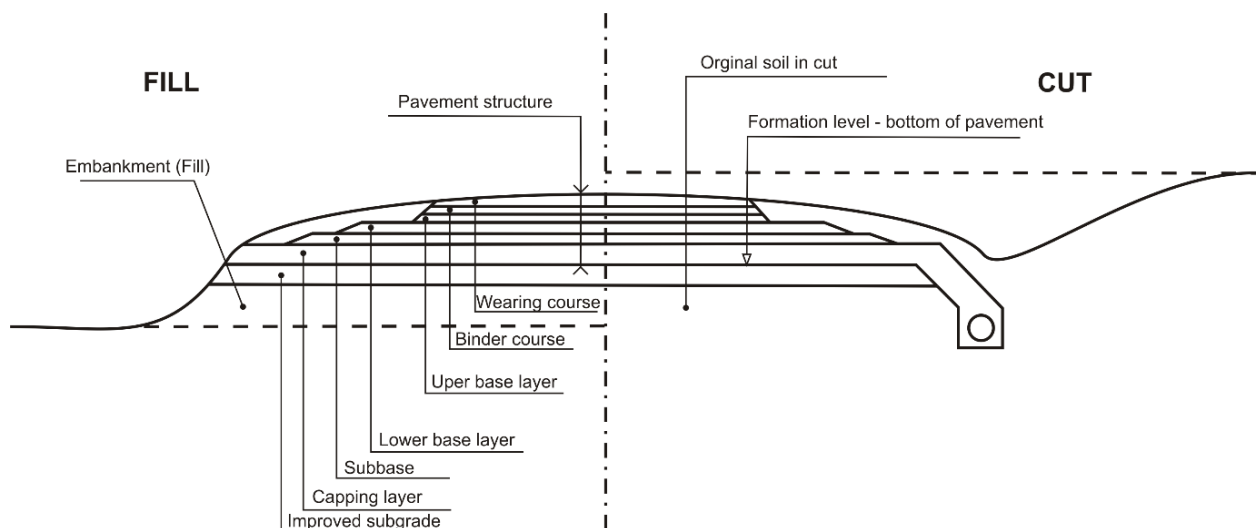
Cross section of pavement structure (Judycki et al., 2012).
